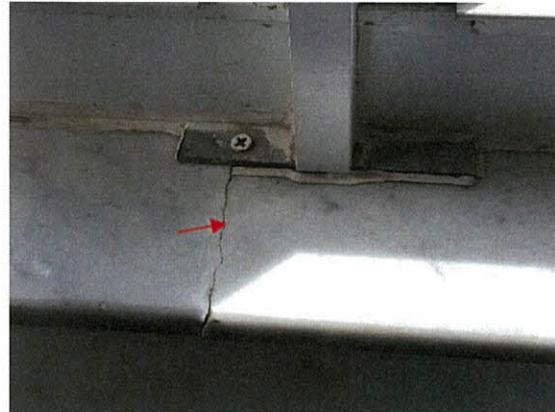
Cracked window sill and displaced window bottom connection caused by the buffeting of windows due to Irma's wind pressures (902S)
